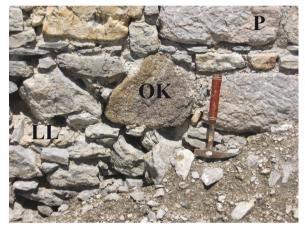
A piece of Oligocene fine-grained conglomerate (OK) in the tower wall. Limestone from the quarry in Povodje can be seen in the reconstructed corner of the tower. Local quarry stones (LL) were found in the original wall.
